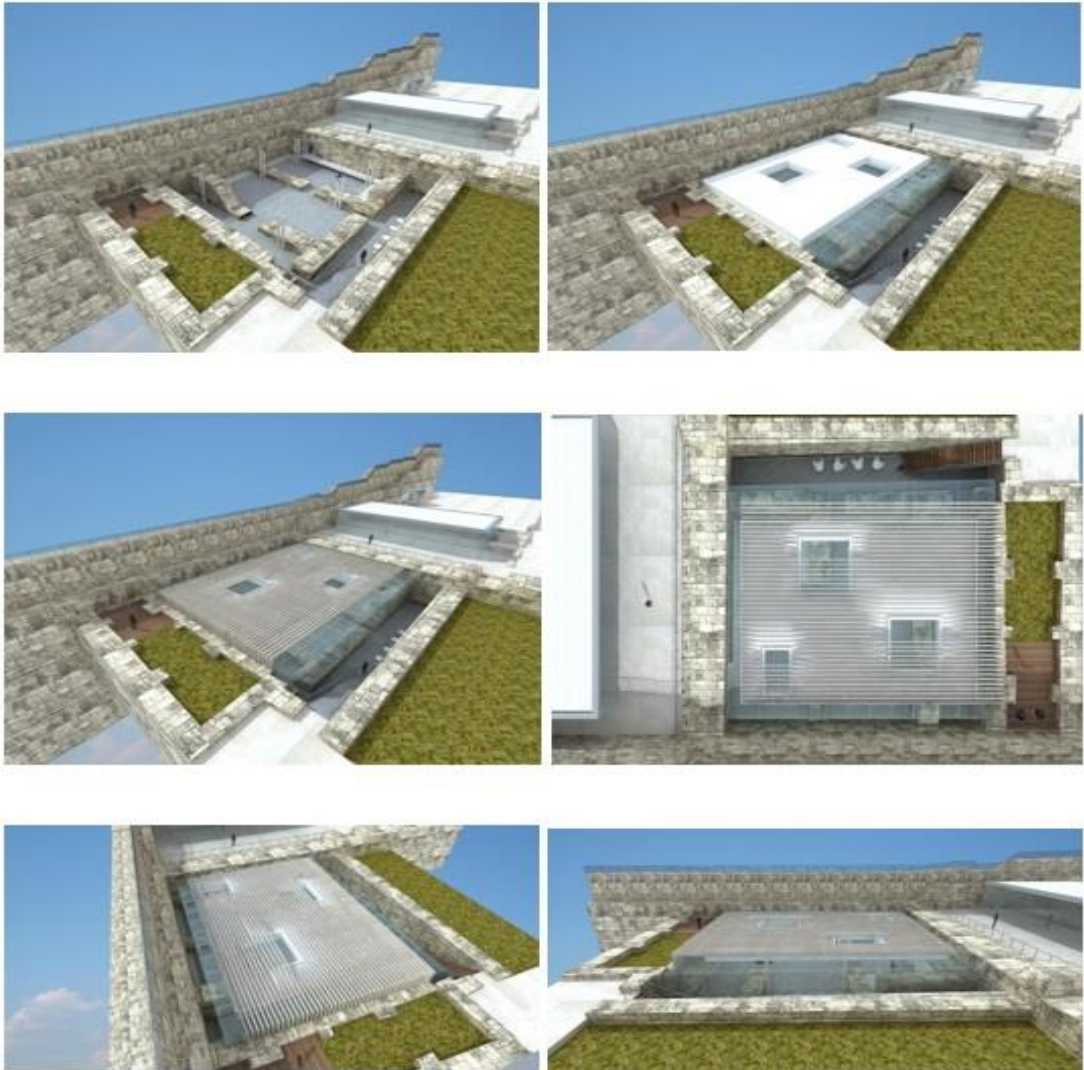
3D images of the layers and the completed roof (Source: Kimmel, Etan. Davidson Center. 2015. PDF file)
